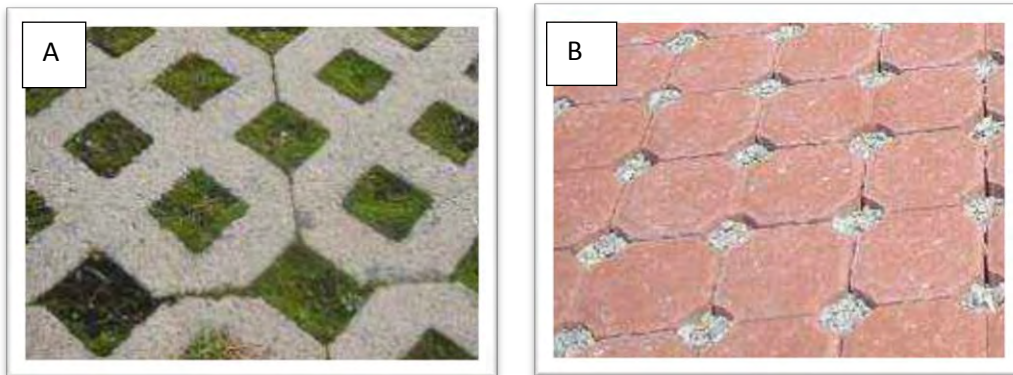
Example A- Concrete Grid Pavers Example B- Permeable Interlocking Concrete Pavers
